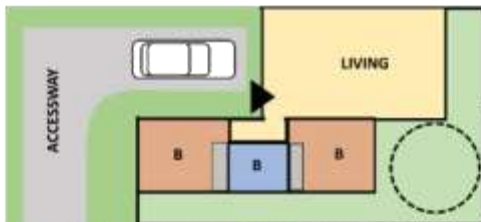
Example of a single-storey, two-bedroom dwelling without a garage.
